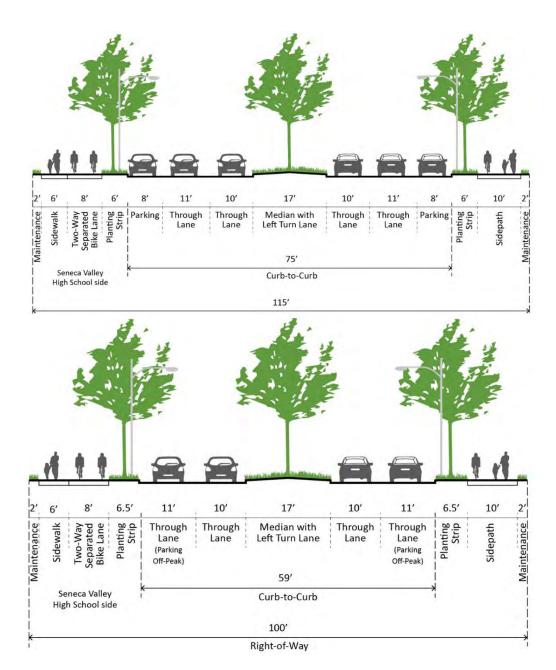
Existing Wisteria Drive Street Section Clarksburg Road Street Section
